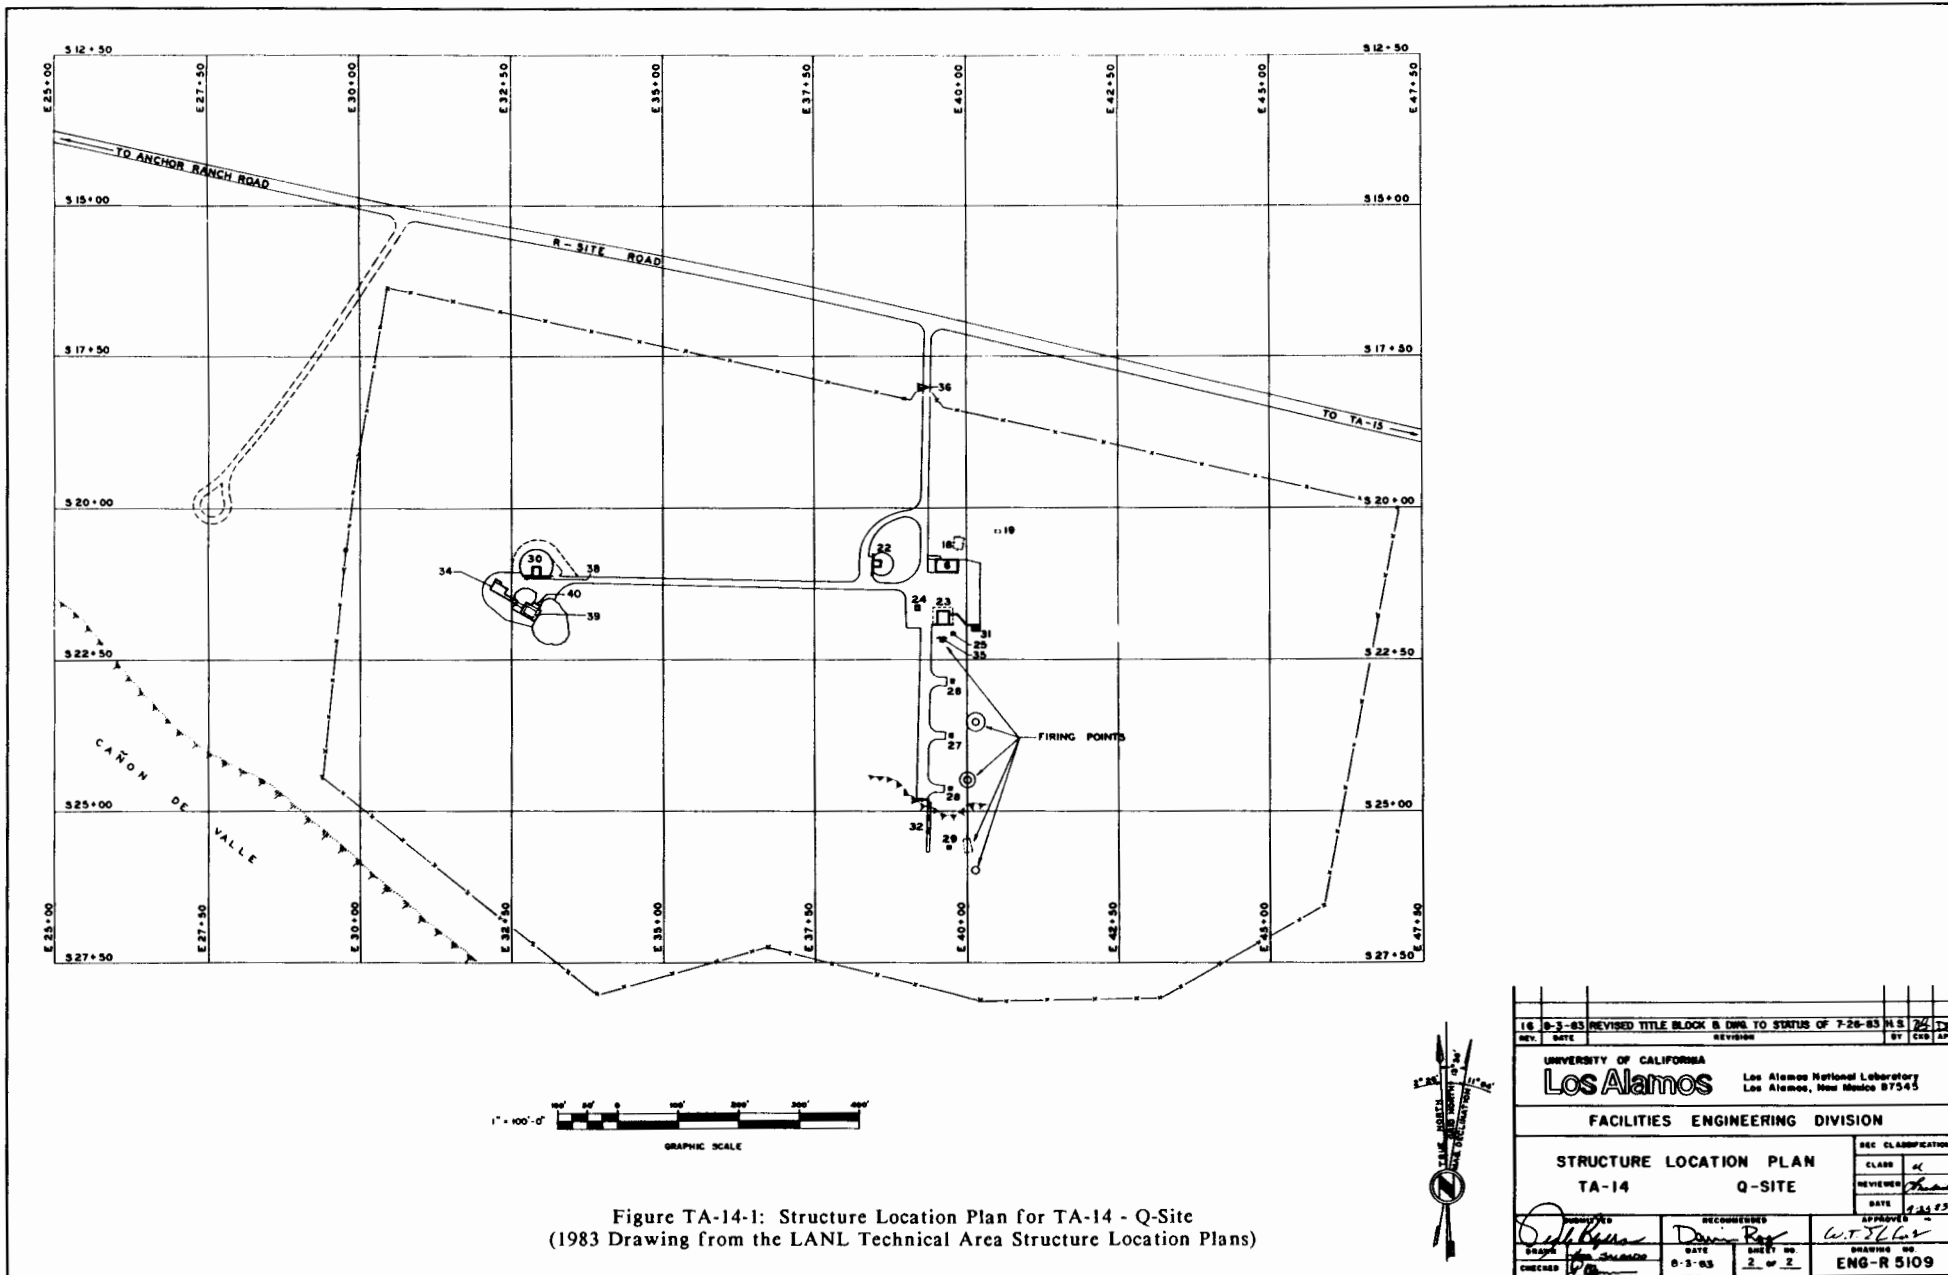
Structure Location Plan for TA-14 - Q-Site
